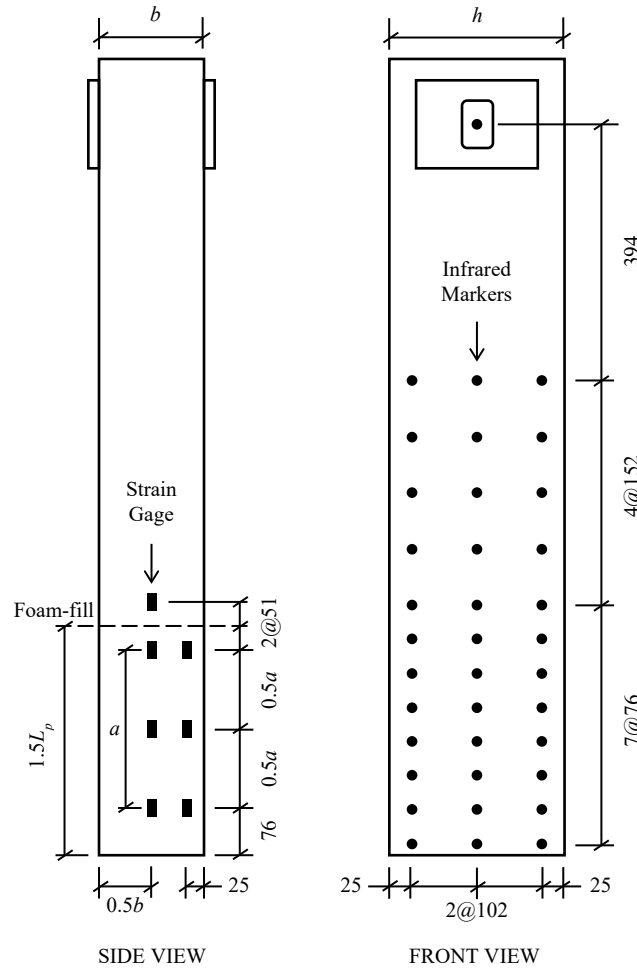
Instrumentation diagram for the tested beam sections. All units in mm.
